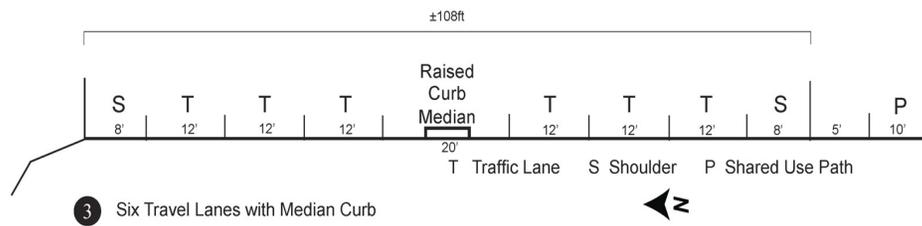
ALTERNATIVE A BETWEEN DOWELL ROAD AND FAIRGROUNDS ROAD
